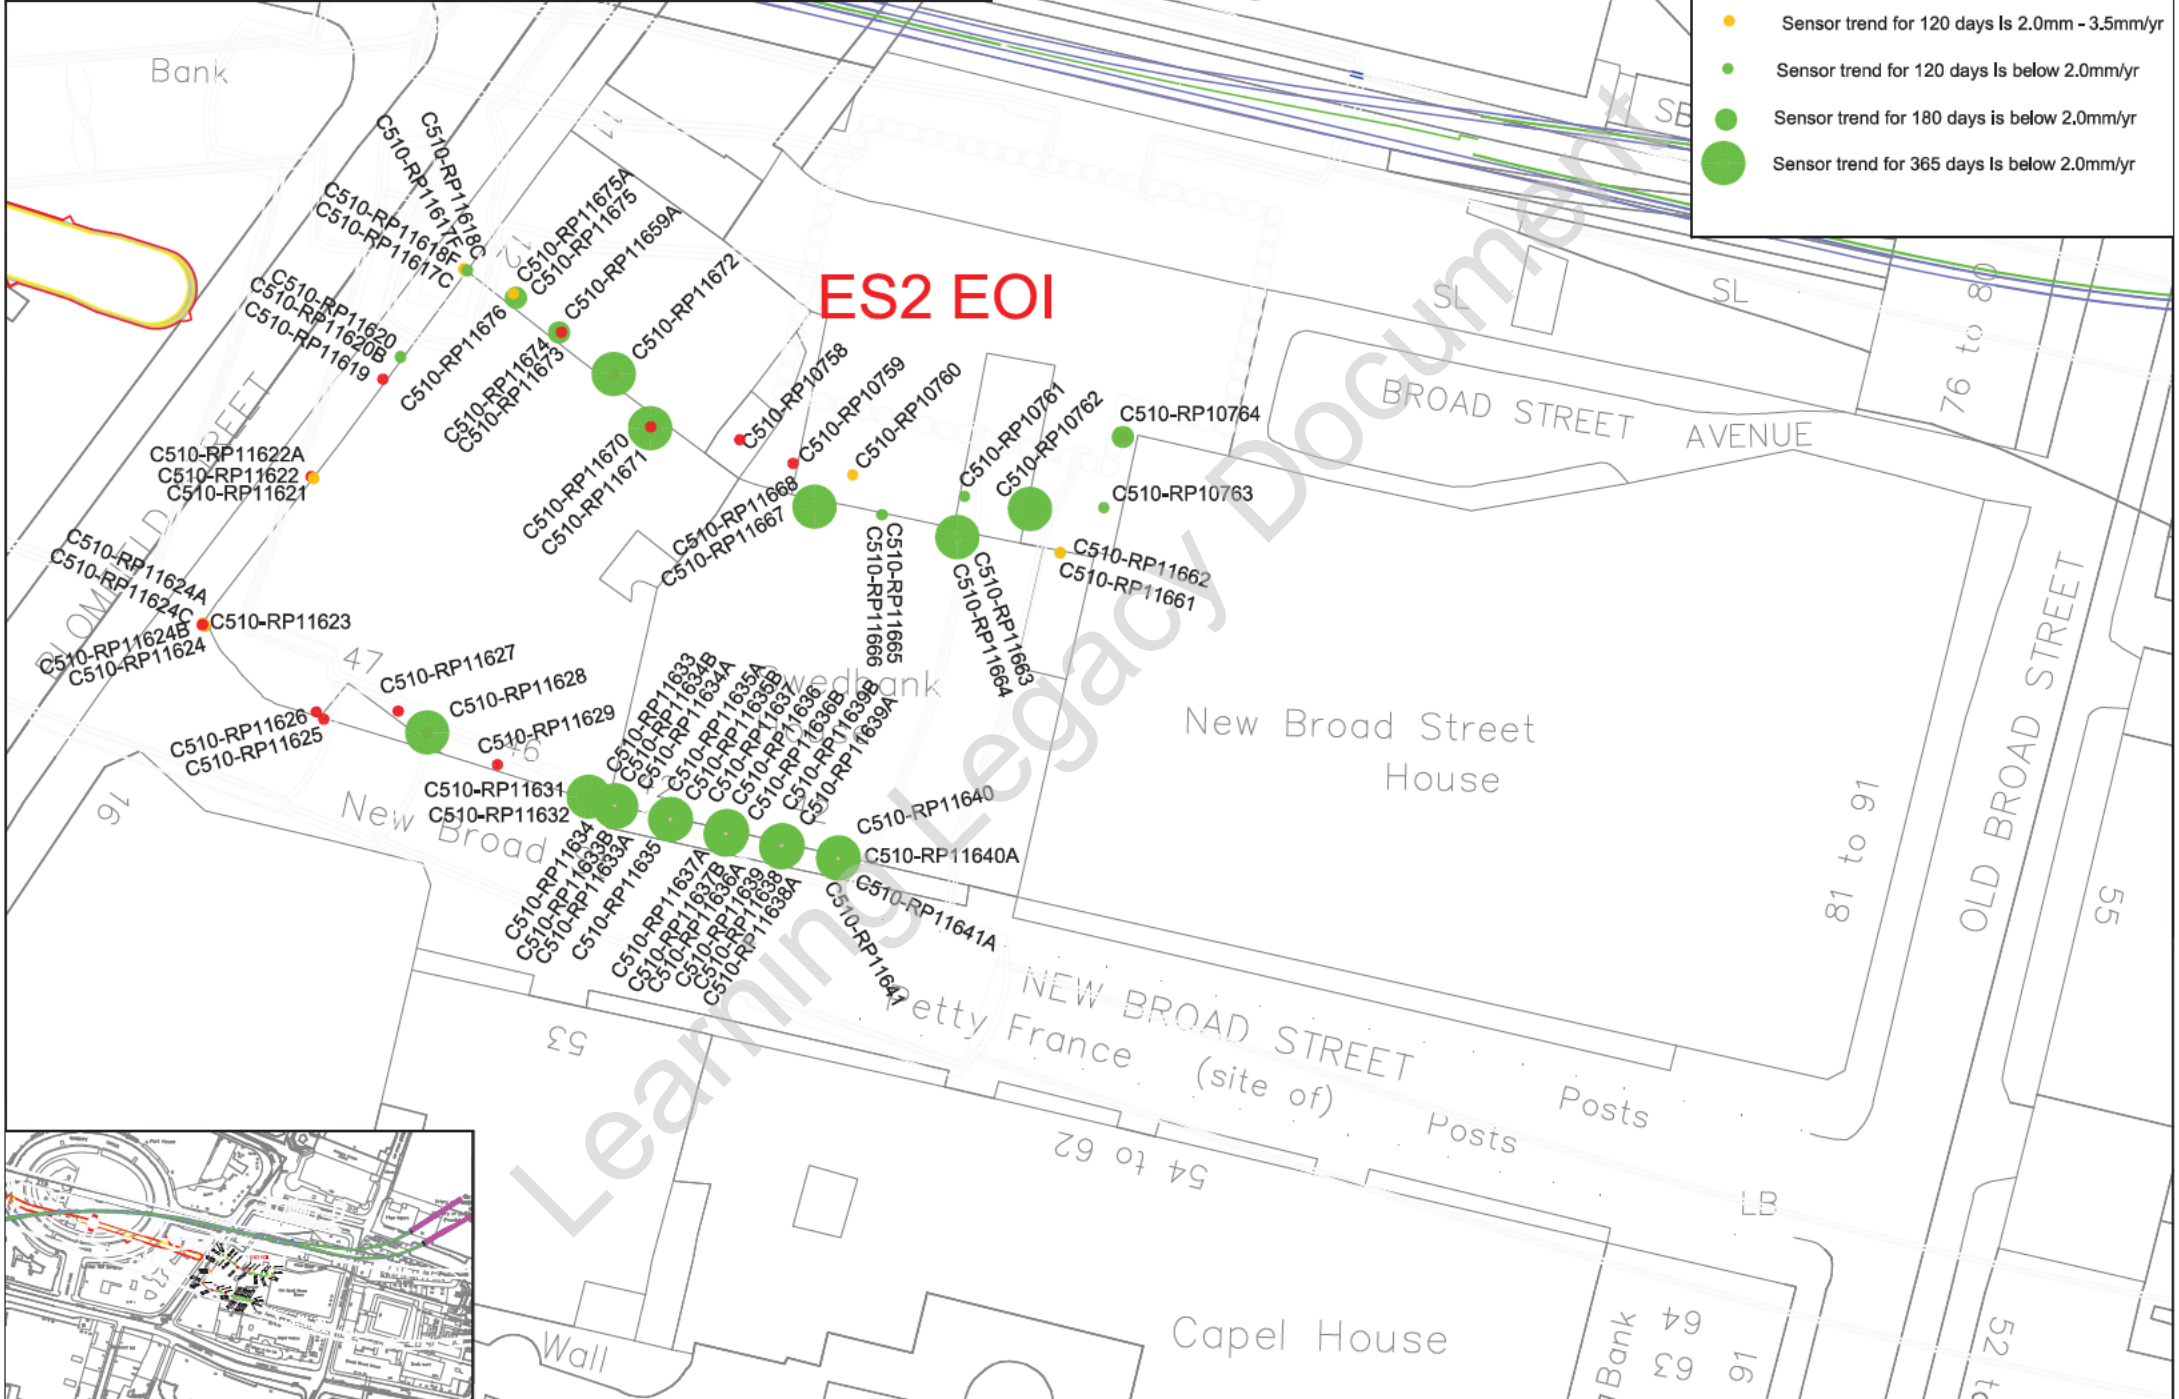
SH Monitoring Sensor Decommissioning Status and Location Plan
